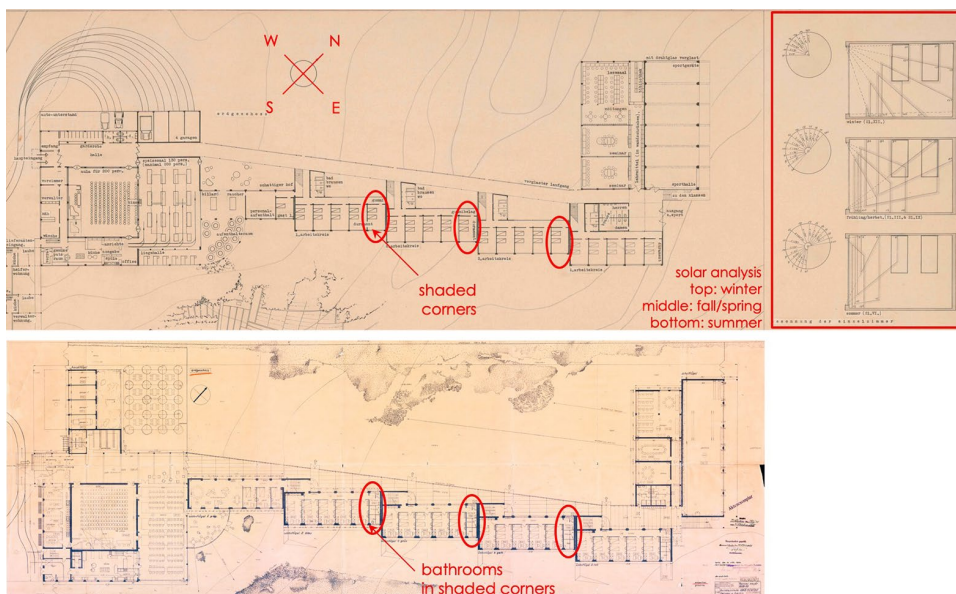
Top: Competition Board Detail with First Floor Plan and Solar Entry Studies, 1928. Bottom: First Floor Plan as Built, 1930. Red: Author Notes. Sources: Stiftung Bauhaus Dessau (top), Stadtarchiv Bernau (bottom).
